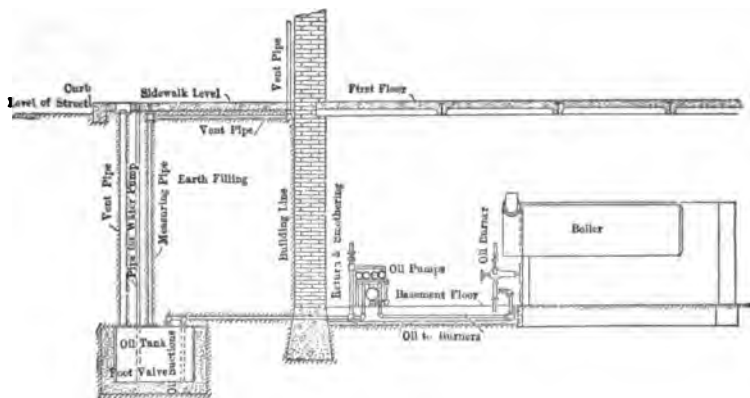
A diagrammatic sketch of an oil tank shown below the basement floor level when boiler is located in a basement where the sidewalk is not excavated.
